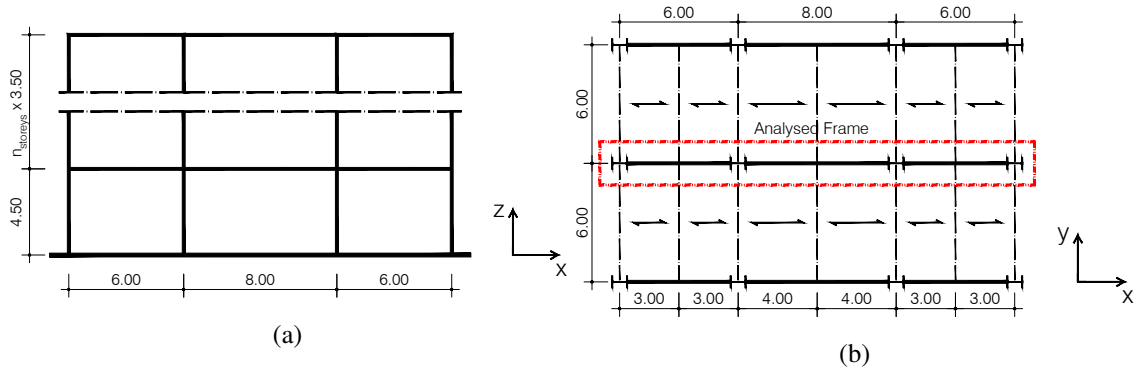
Building configuration 2: (a) Elevation view, (b) Plan view.
